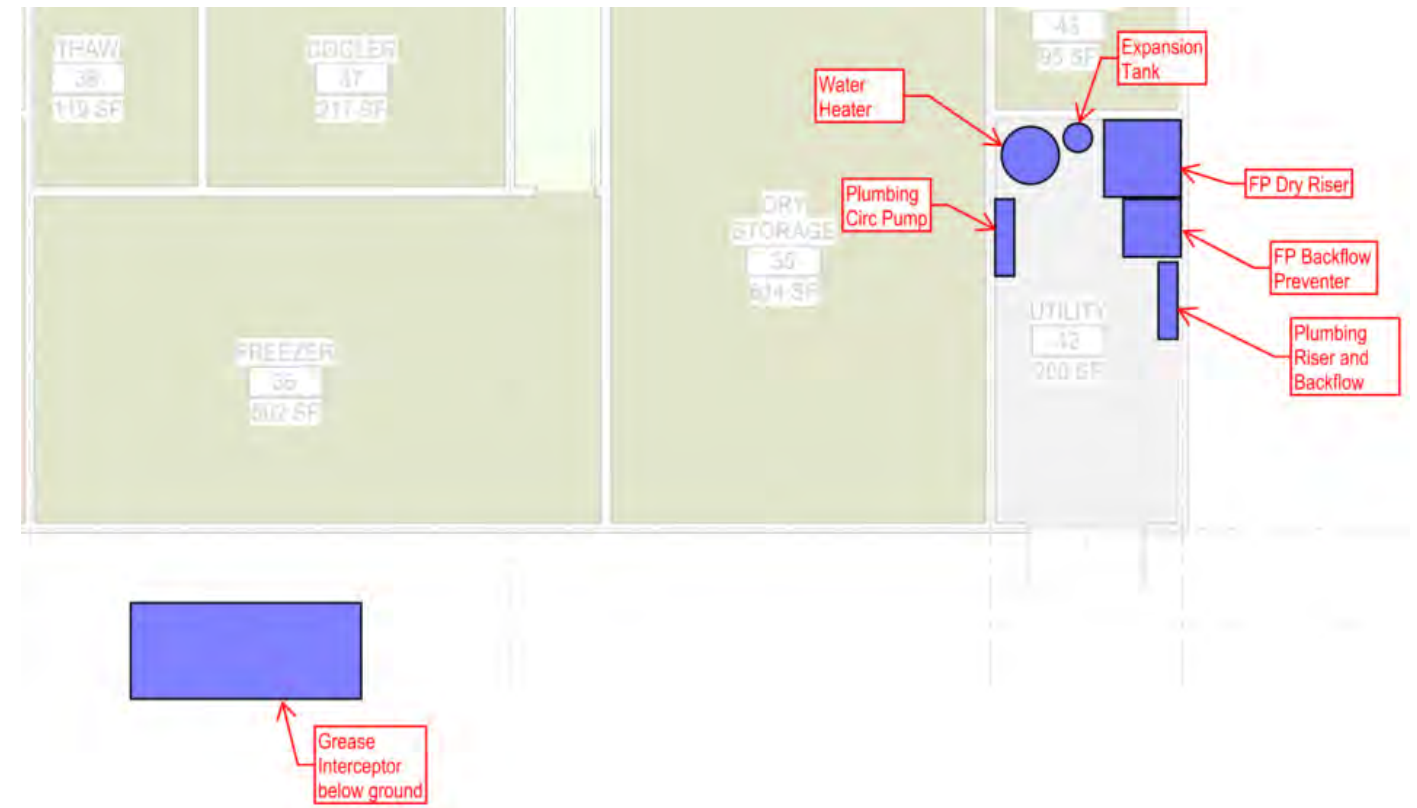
ANIMAL CARE BUILDING PLUMBING EQUIPMENT
